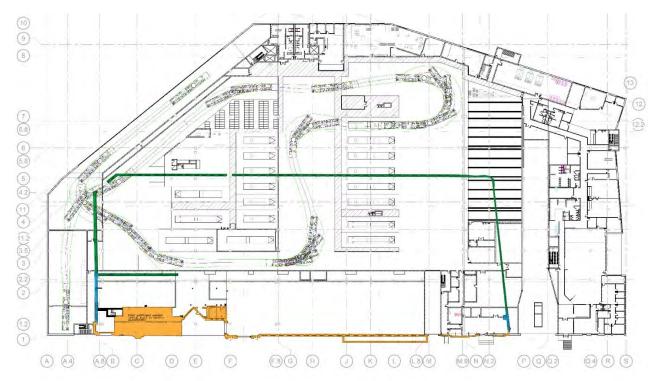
Proposed upper level plan of bus garage with historic overlay; the 14<sup>th</sup> street (west) façade will be retained along with the administrative offices and tower (Wendel)
